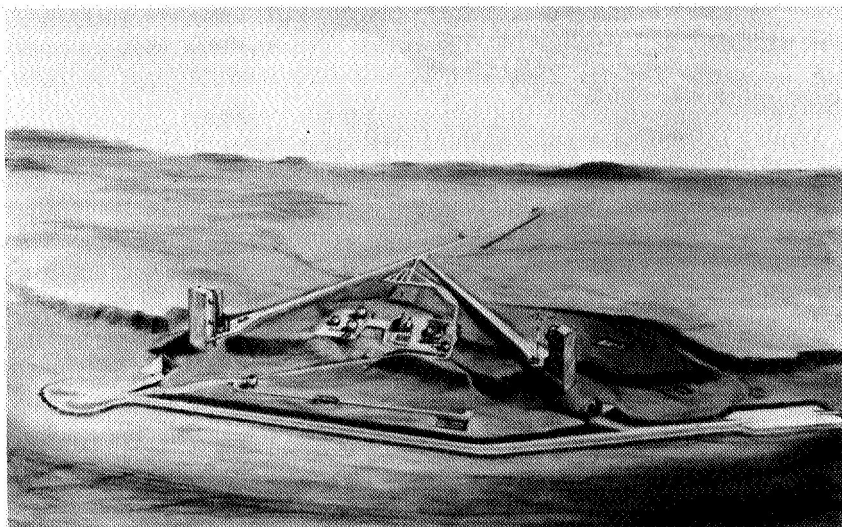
Engine/Stage Test Stand 2 and 3 Complex Site Plan.
